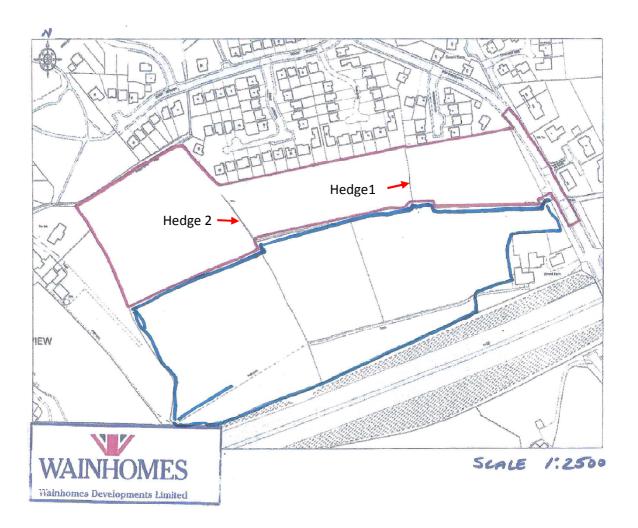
Site Plan: Wainhomes edged red; Taylor Wimpey Land edged blue
